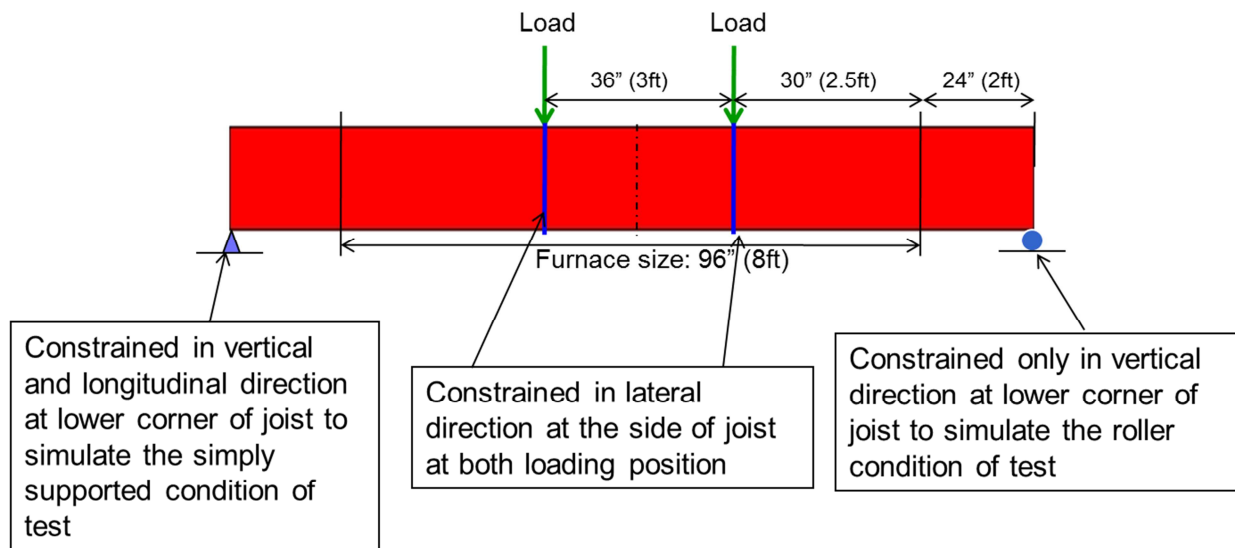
Structural boundary conditions and loading locations for unconstrained beams
